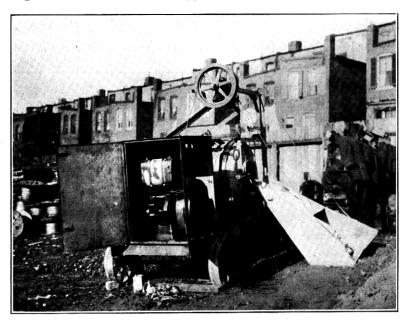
Concrete Mixer Adapted to Meet Telephone Construction Requirement
